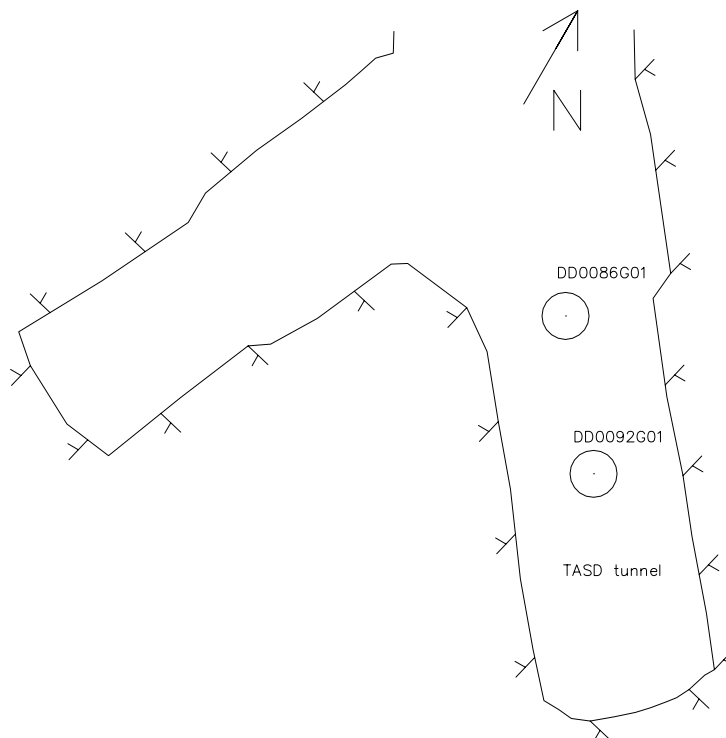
Plan view over the Canister Retrieval Test tunnel with its two deposition holes.
